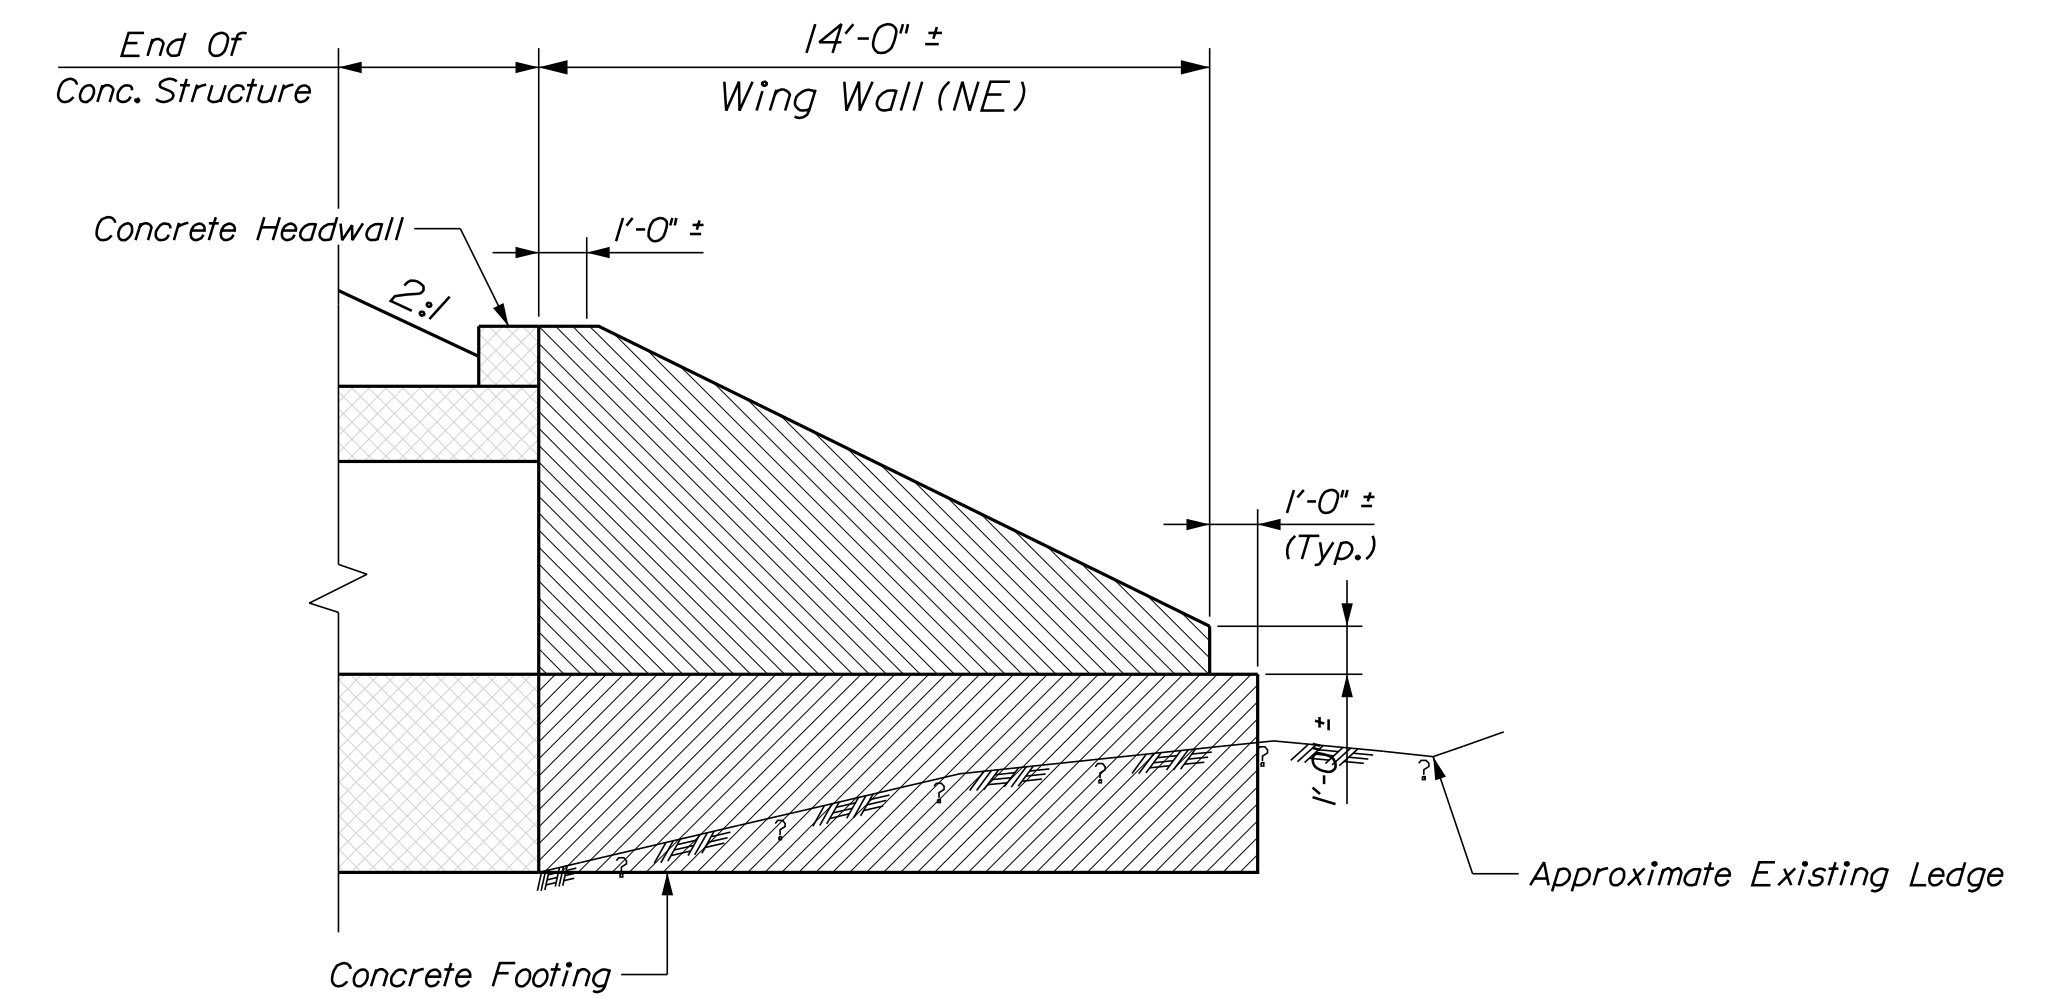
DETAIL BUILD BRIDGE HEADWALL AND WING WALL NOTES:
